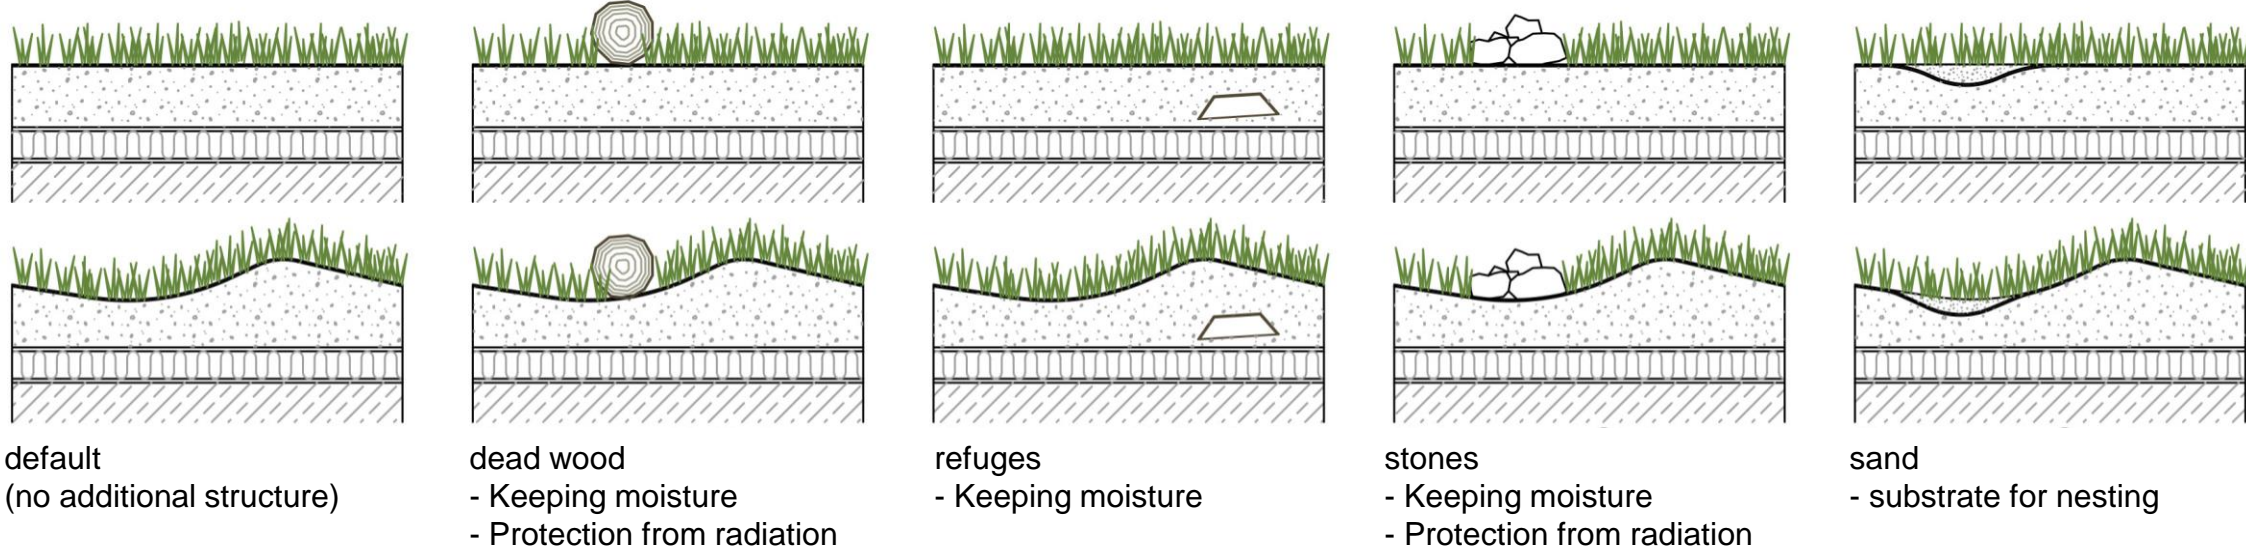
Soil Life Roof Experiment (SoLiRoof)
